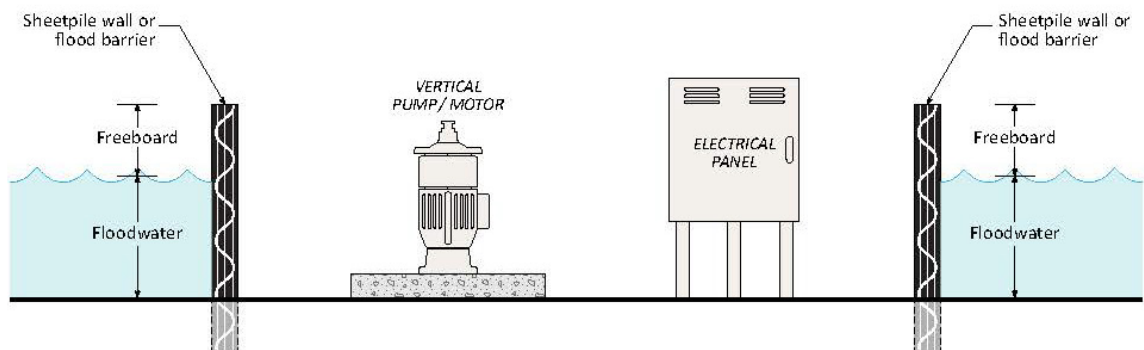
Dry Floodproofing – Installation of Static Barriers for Equipment Protection
